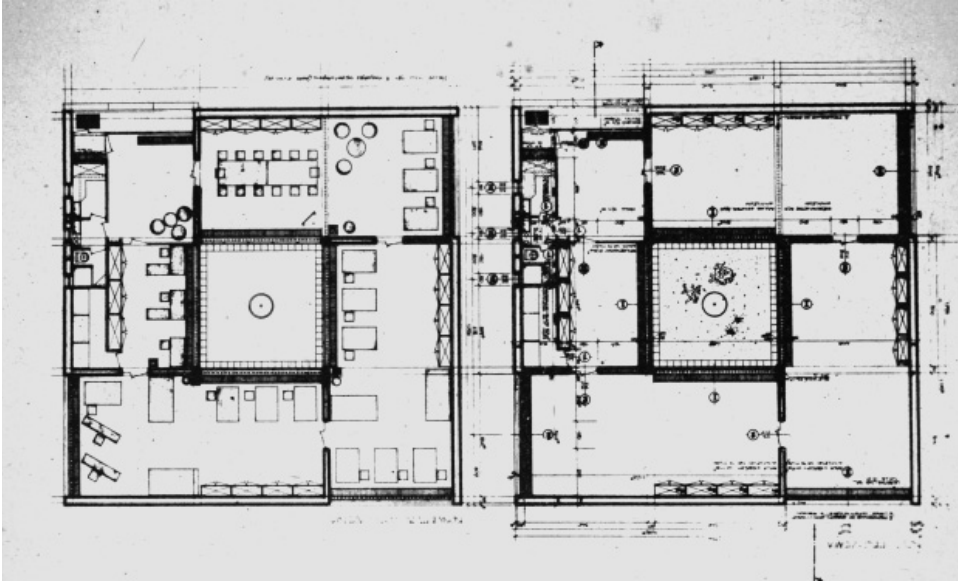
General Building Design Studio in Katowice. Ground plan. AHBSL, without ref. no.
